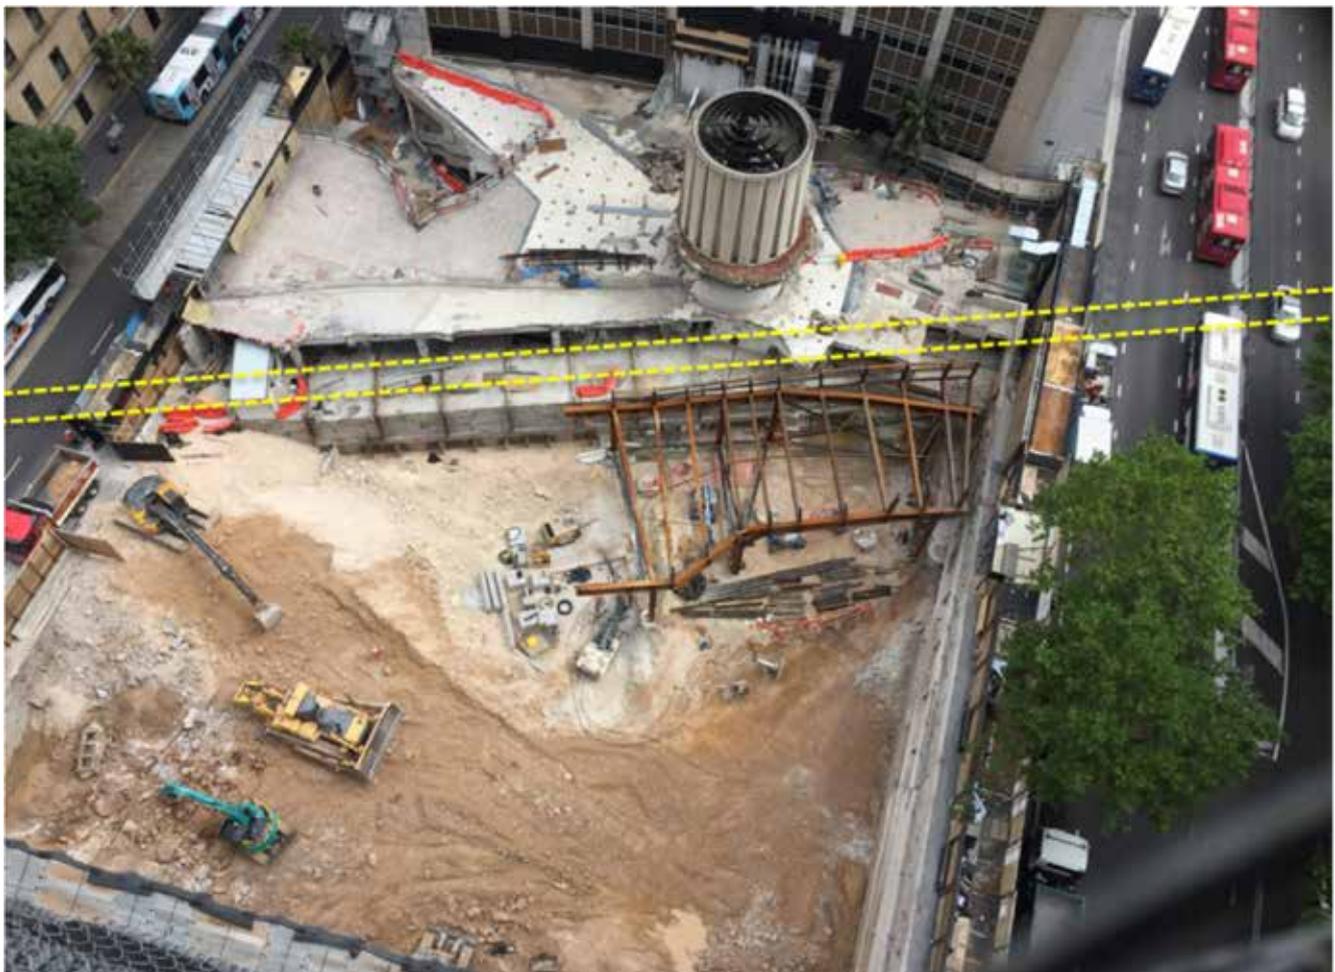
Site photo showing location of Heritage Drain, along with details for management throughout construction.
